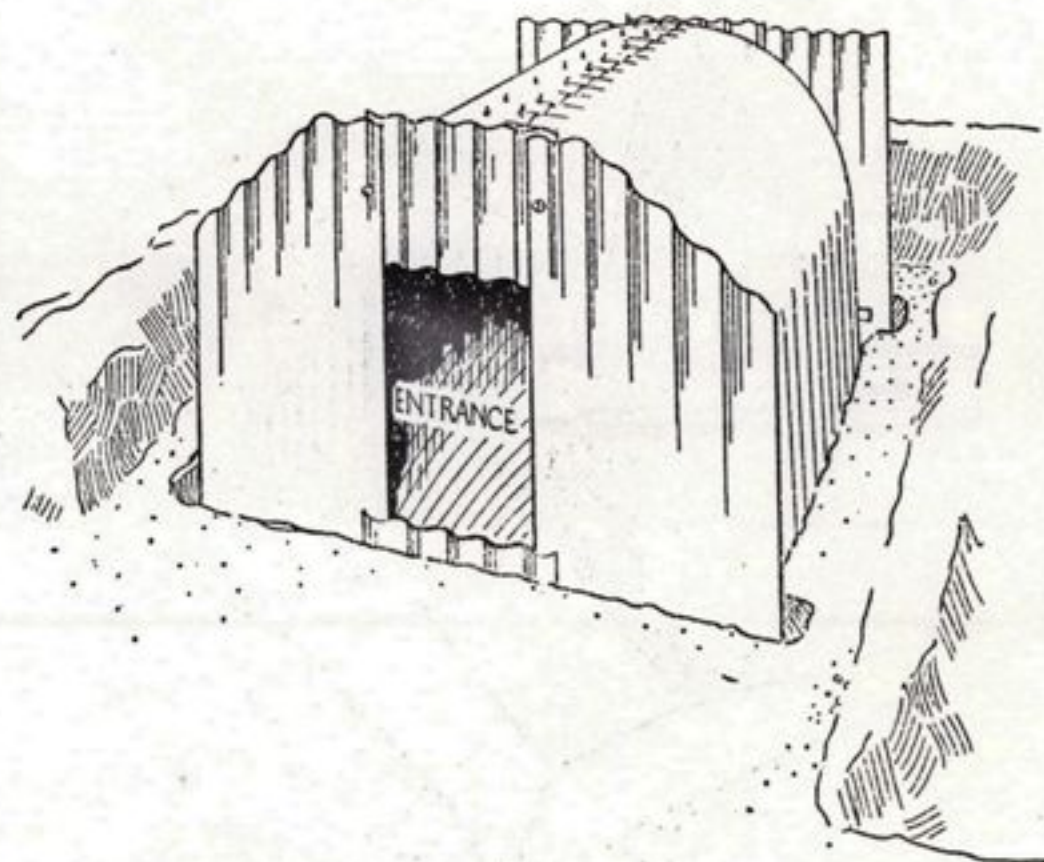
STAGE 11. VIEW OF FRONT END OF SHELTER
